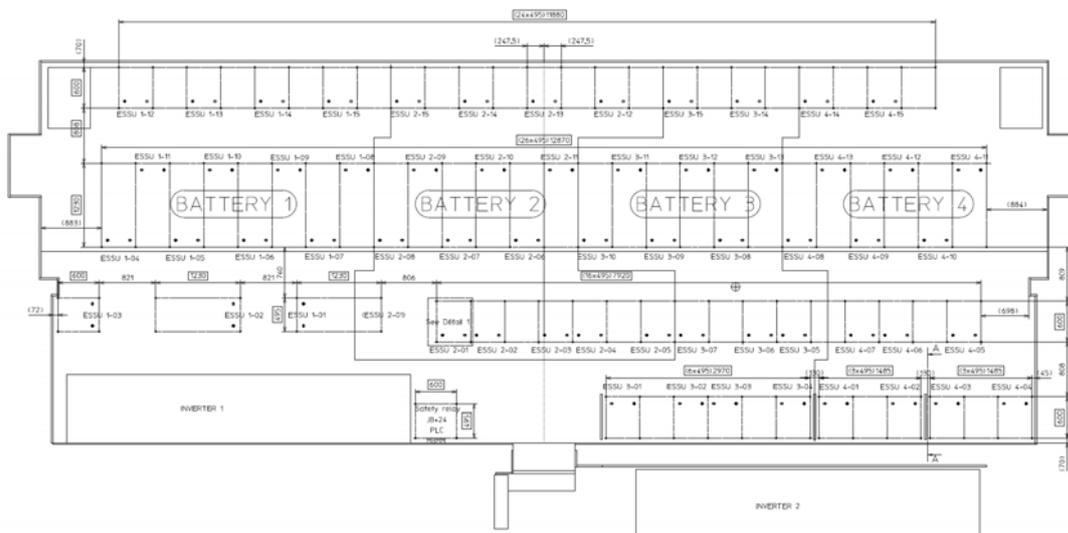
Layout of the battery room. The ceiling is placed at 2081 mm from the floor. Distances are in mm.
